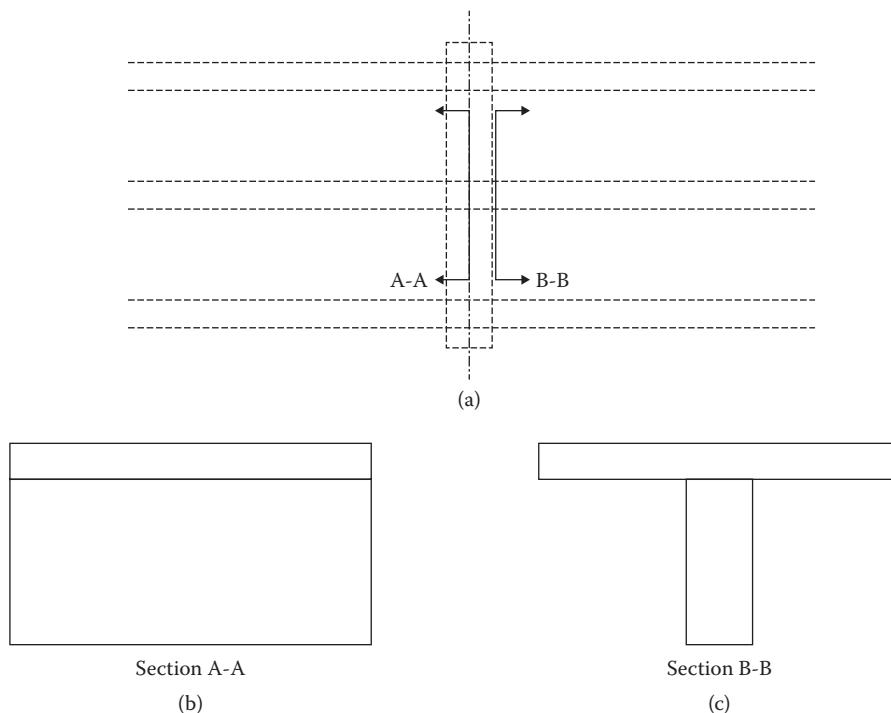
Details at integral bent location: (a) Plan view at bent or pier, (b) Section taken at the centerline of bent, (c) Section taken at the face of the support.
